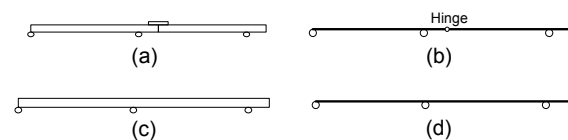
Boundary condition change due to girth-welding of two girder segments: (a) sketch map before girth-welding; (b) boundary condition before girth-welding; (c) sketch map after girth-welding; (d) boundary condition after girth-welding
